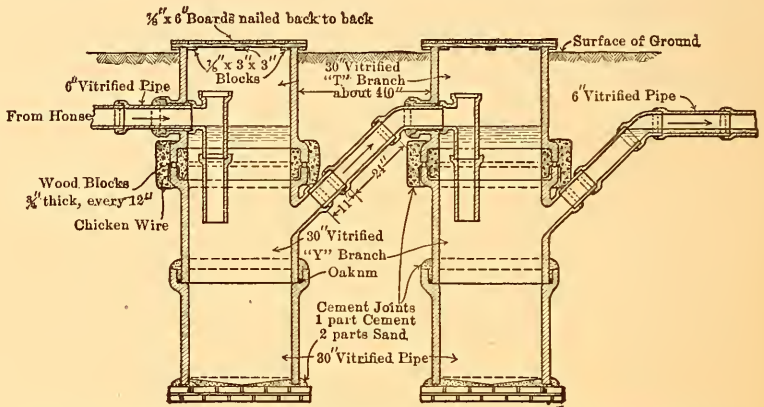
Septic Tank Installation Constructed of Large Sewer Pipe.
